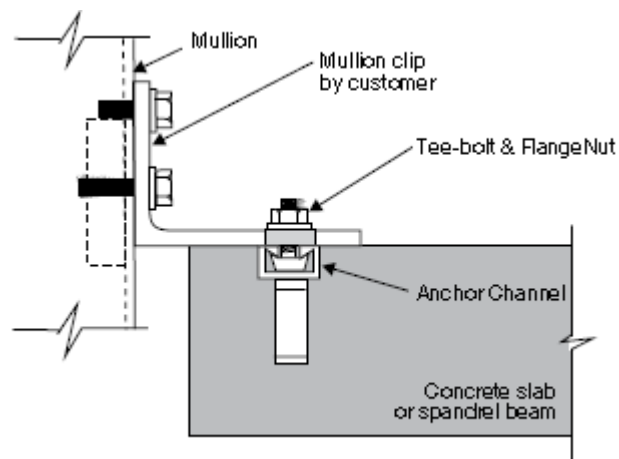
Profile view of a typical top of slab cast-in-place channel embed with bolted anchor clip assembly from the side (www.halfenusa.com)
